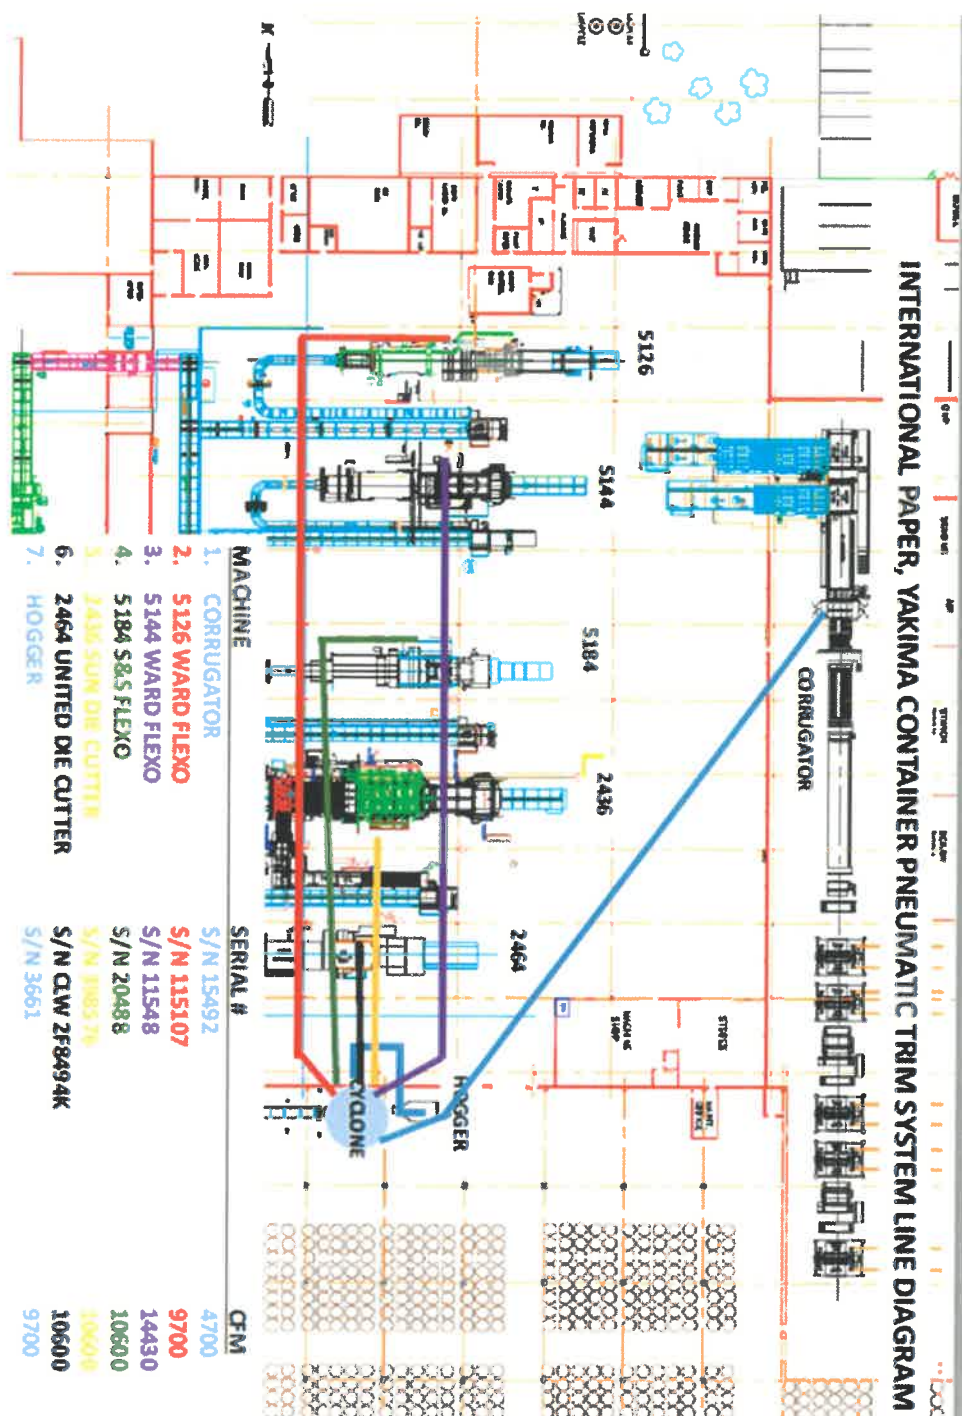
New Floor Plan showing current equipment locations and their respective Flows. The Sun 625 unit is (#2436).
